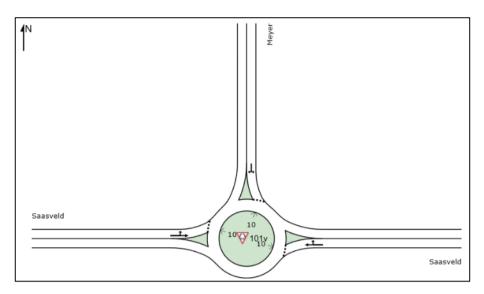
Proposed Layout: Saasveld Road & Meyer Road
